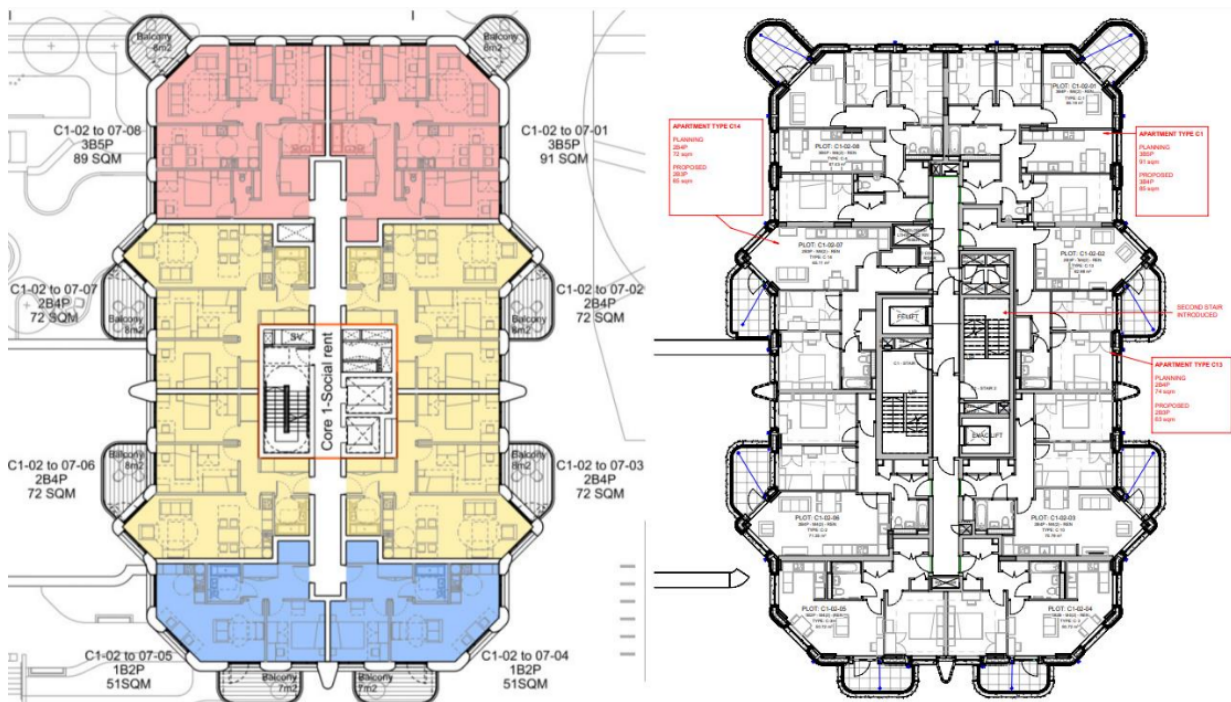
Block C1 staircase changes (proposed amended on right hand side)
